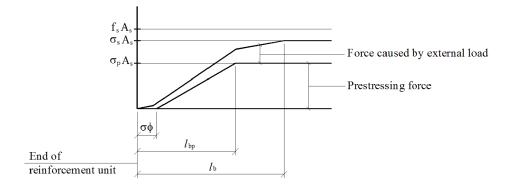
Prestressed force introduction length where prestressed force is anchored in bond
